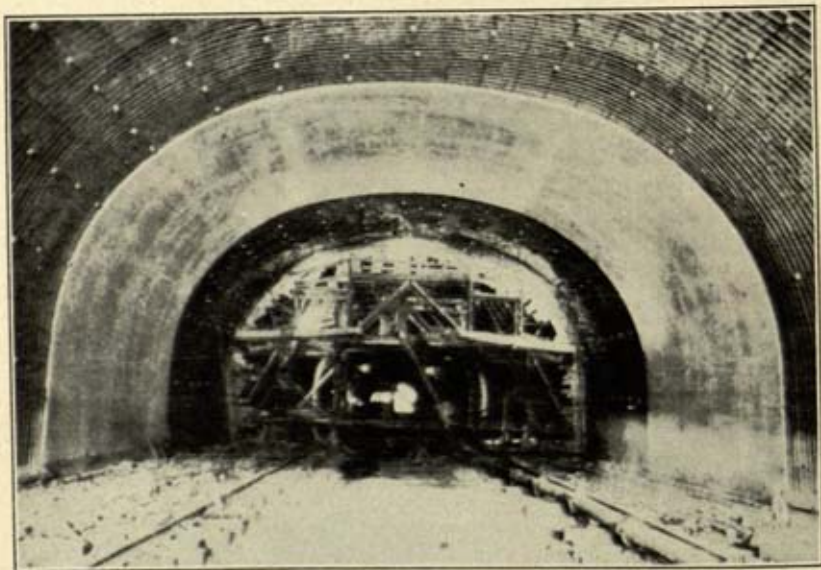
Two sets of steel forms used to place concrete lining in a tunnel. (Arizona Highway Department.)
